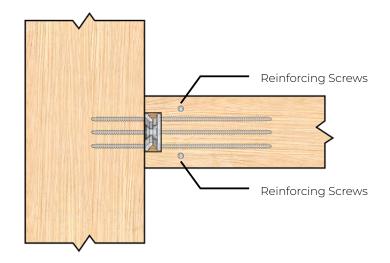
Top View Showing Reinforcement Placement Outside of Beam Hanger Assembly
